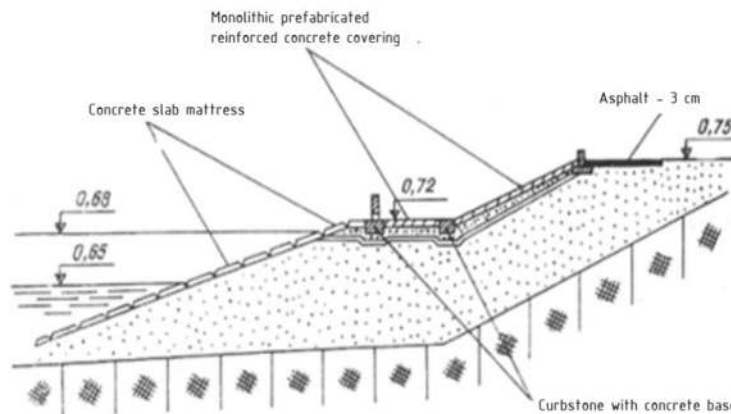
Underwater mounting of slopes with plates of flexible construction
